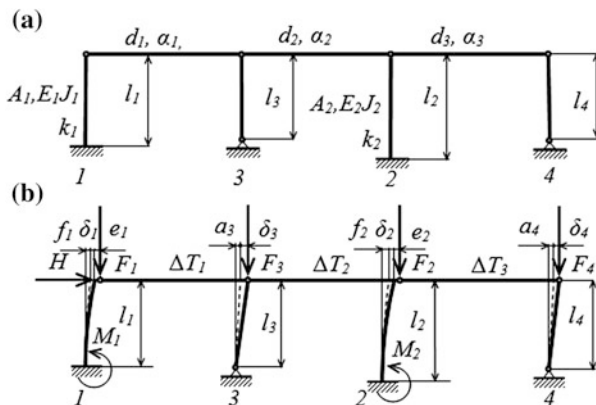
Planar frame a undeformed situation, b deformed situation
